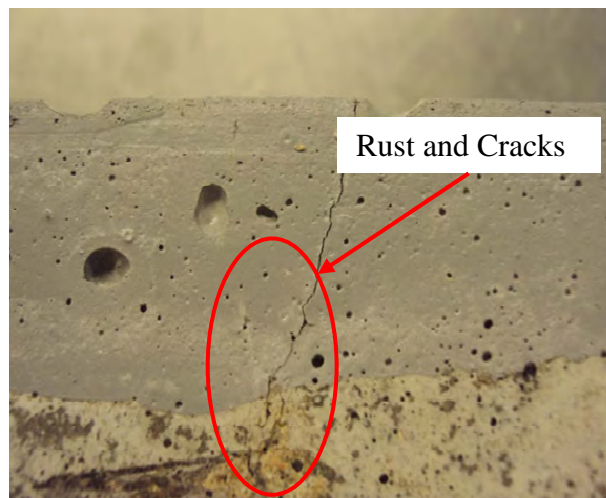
Rust and cracks on specimen SP3-CI-9
